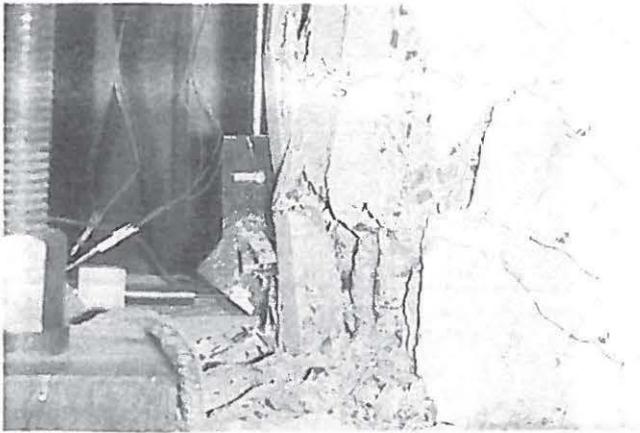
Specimen CFL90/0.30: Buckling of longitudinal bar in single tie spacing.
